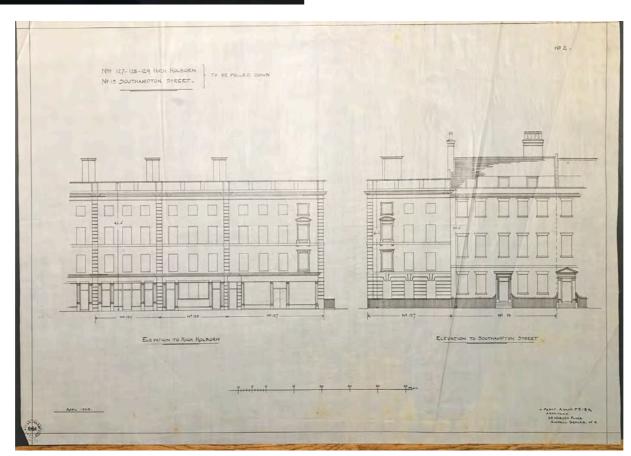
Block Plan of Proposed Building Site 127-129 High Holborn and 13 Southampton Street. 1903 and showing division and indiactes where the single storey buildings are located and the elevations to High Holborn and Southampton Row prior to Norwish/Norfolk House
